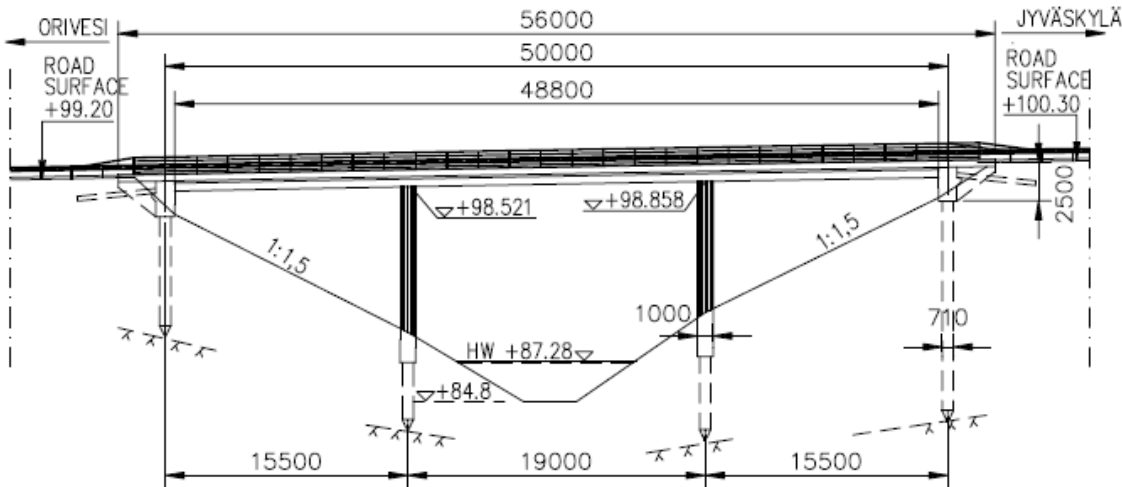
Elevation of Haavistonjoki Bridge, containing full information about measures (Kerokoski, 2006).
